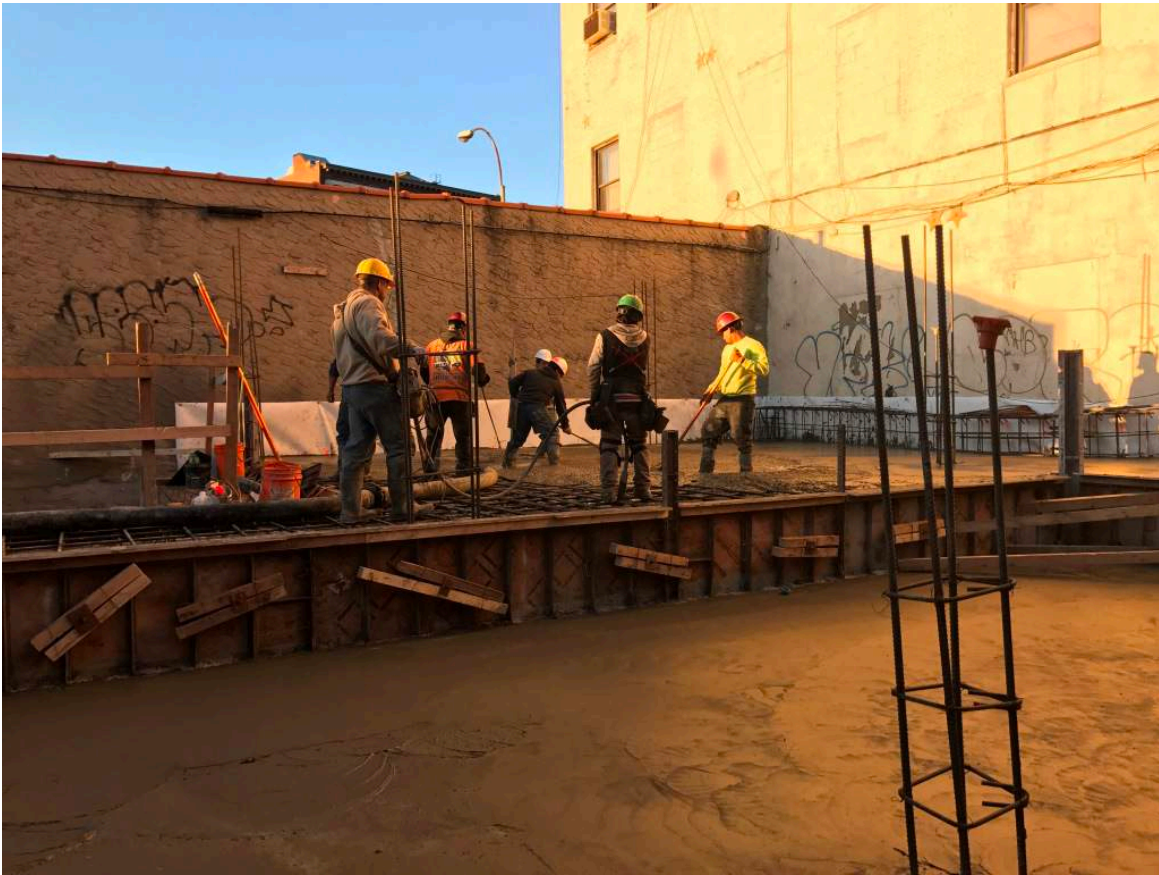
View of the installed concrete in the northern portion of the Site for the first floor, facing north.
